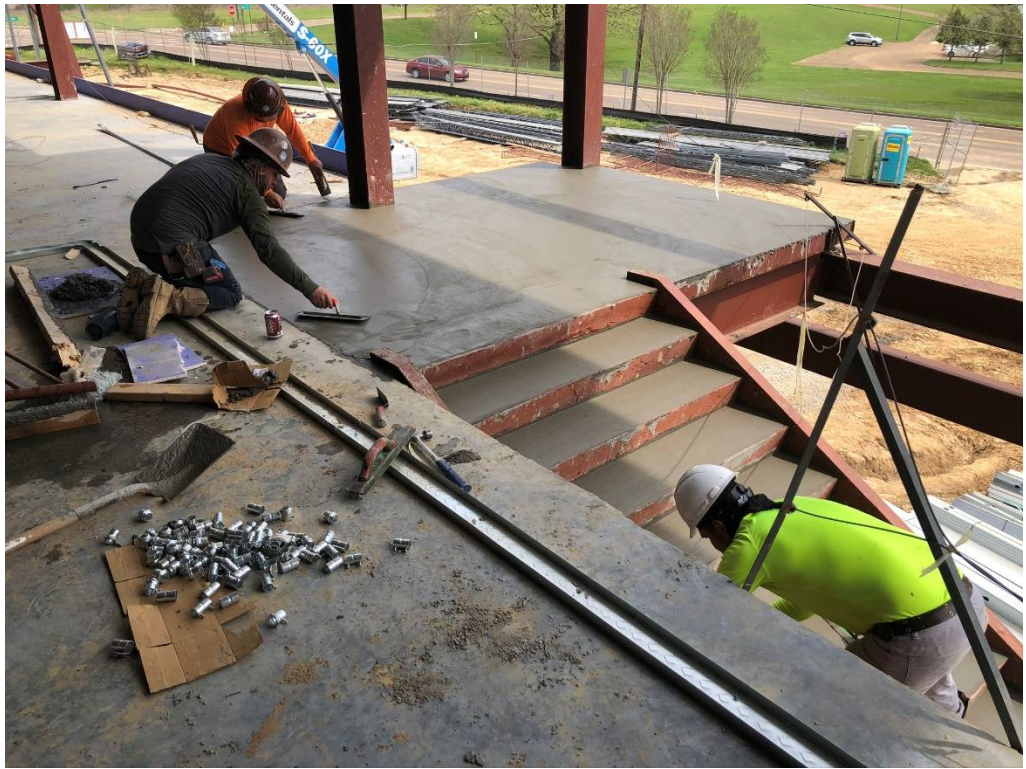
Upper Floor Concrete Work at Pan Stairs
